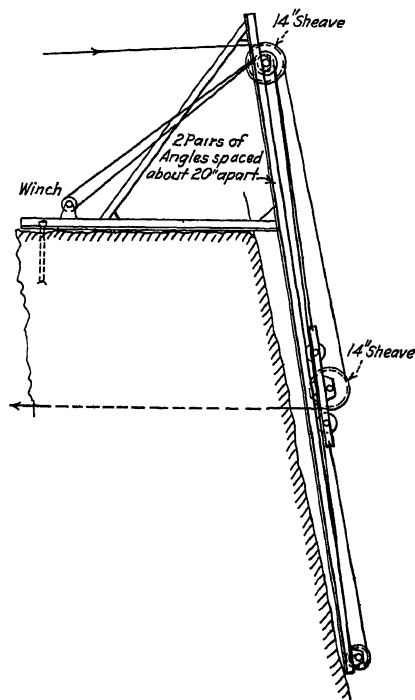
GENERAL ARRANGEMENT OF SHEAVE SUPPORT ON CLIFF FACE AND METHOD OF ADVANCING WIRE INTO CUT.
